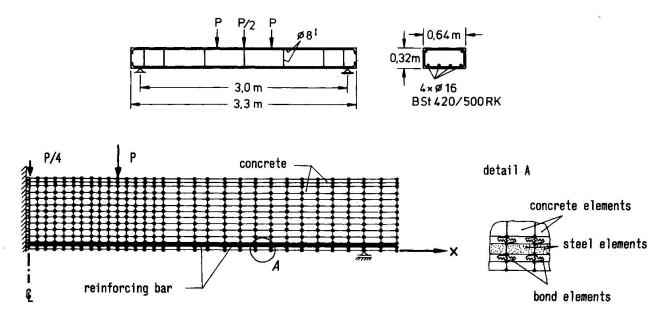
Test specimen [10] and Analytical Beam Mesh Layout
